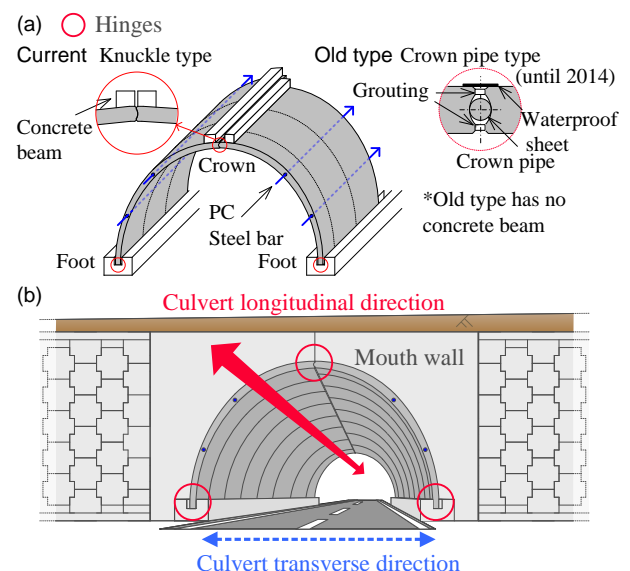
Three-hinge type of precast arch culvert: schematic drawings of (a) structures and (b) road embankment.
